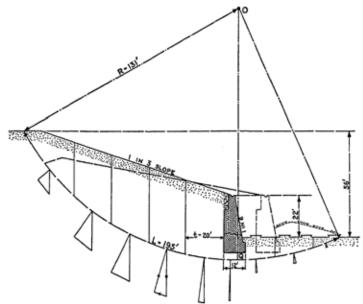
(a).—Overall Stability of Retaining Wall. (Problem 63.)
